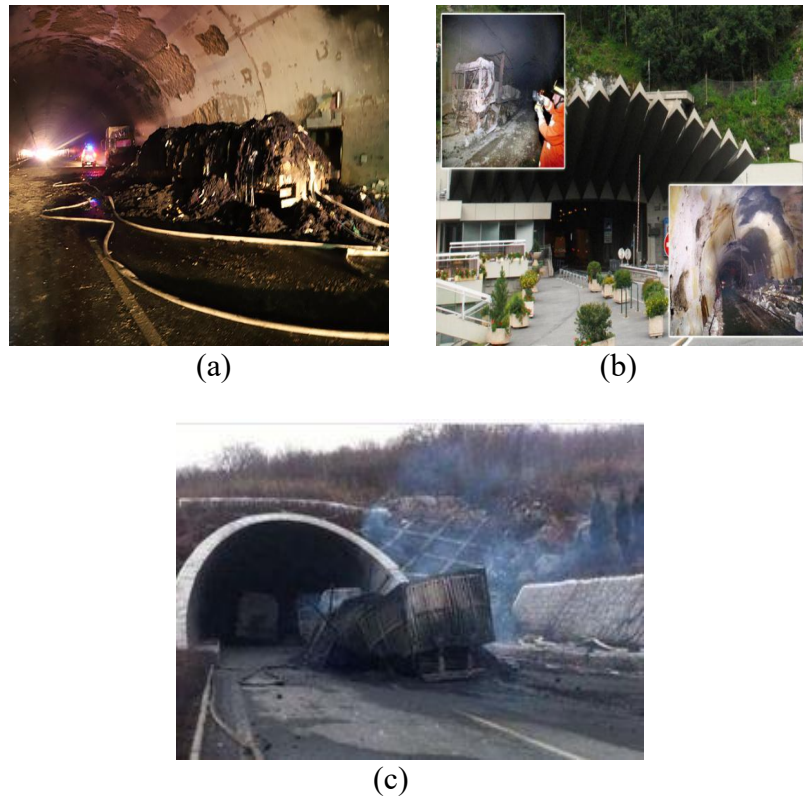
Tunnel damage caused by fire: a. Wenzhou Ring Expressway Jiangbeiling Tunnel; b. British Channel Tunnel Fire; c. Shanxi Jinji Highway Tunnel Fire.
